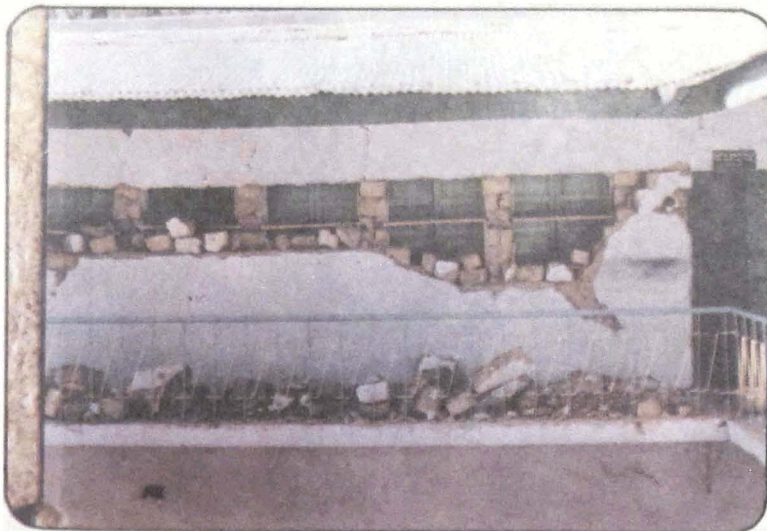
Wall collapses in the first floor of the project engineer's office in Maneri colony.
